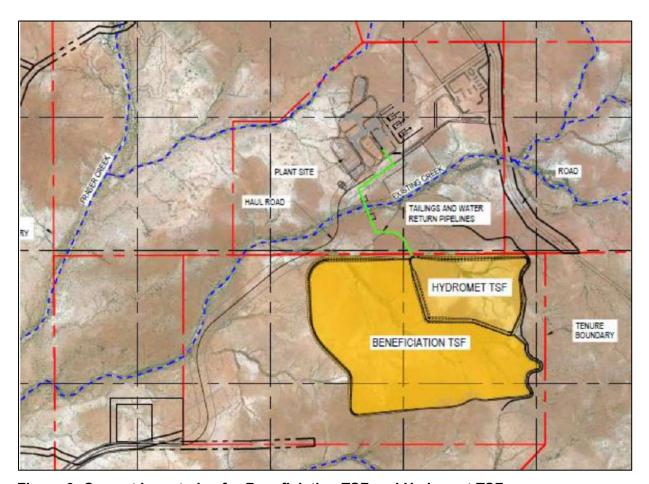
Current layout plan for Beneficiation TSF and Hydromet TSF
